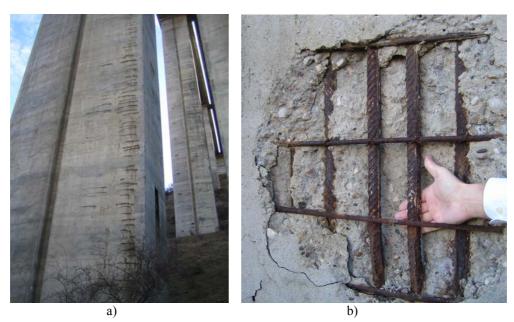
View of the corrosion extension in the: a) "Bebresh" viaduct piers; b) piers of the steel structure viaduct with central span of 162 m.
